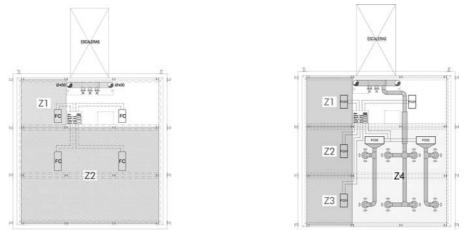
Left, thermal zones on the ground floor and, right, thermal zones on first and second floors (according current layout of KUBIK).
